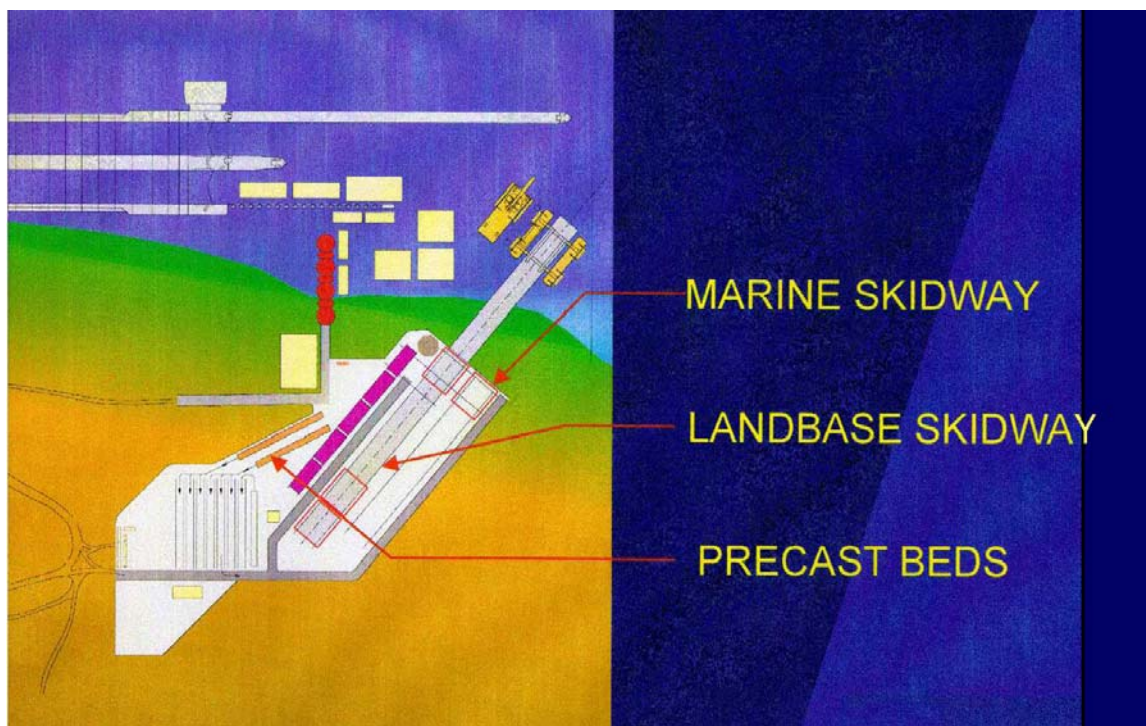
Feasibility level layout of prefabrication facility for Olmsted Dam construction
